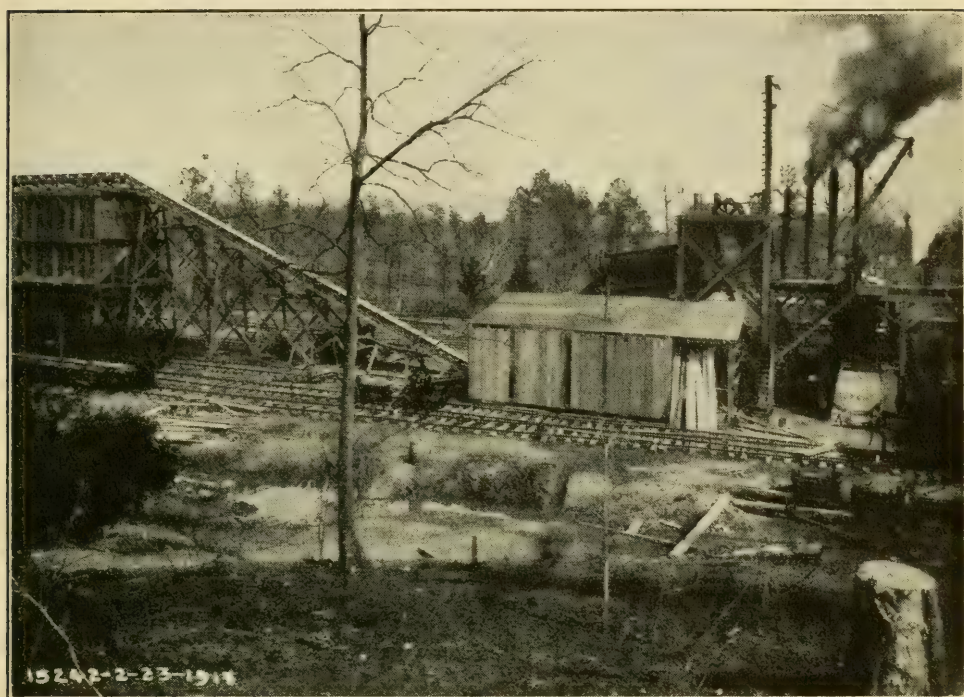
CRUSHER PLANT AT ZION QUARRY, SHOWING ALSO PORTION OF STORAGE BIN.
